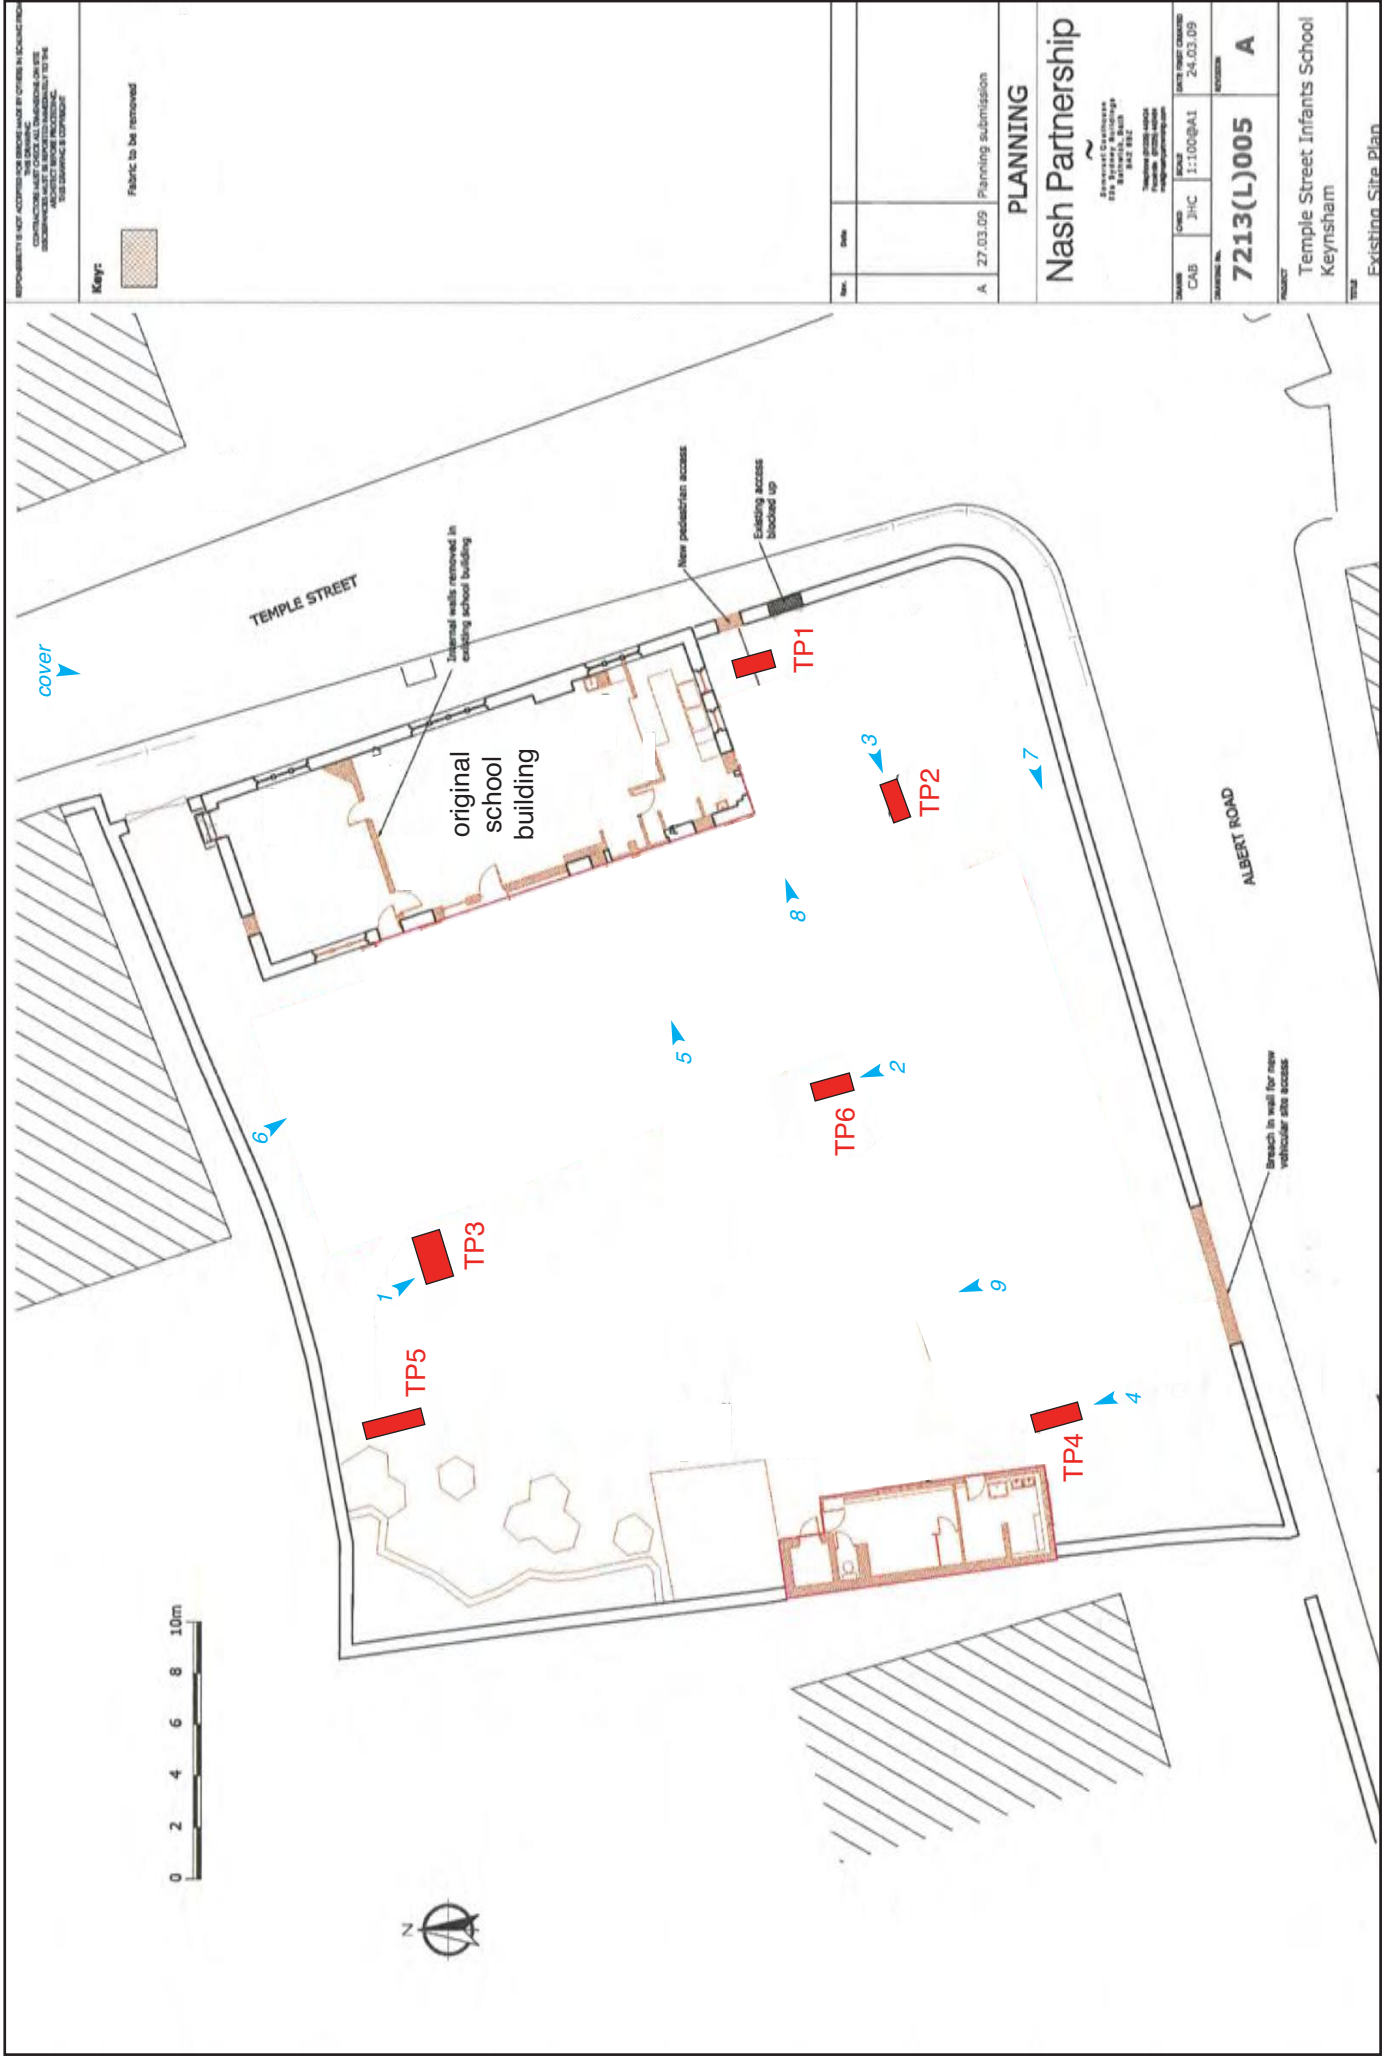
Plan of Temple Infant School, showing location of Trial Pits 1–6, plate directions in blue
